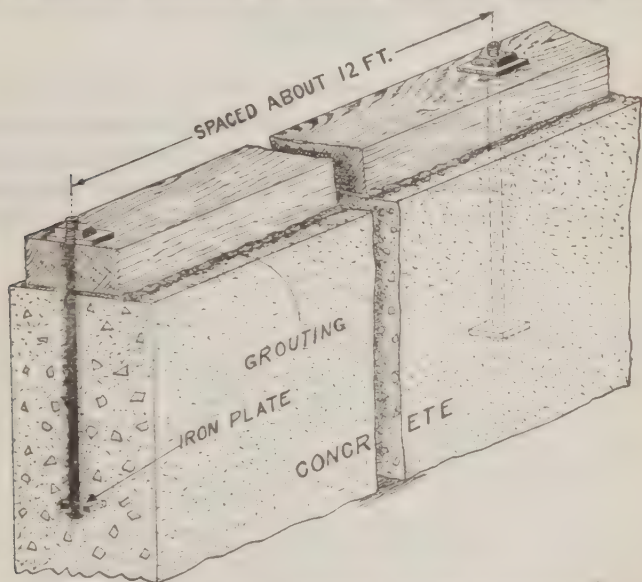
First class setting of solid sill showing sill ceiled with grouting and secured by anchor bolts.
